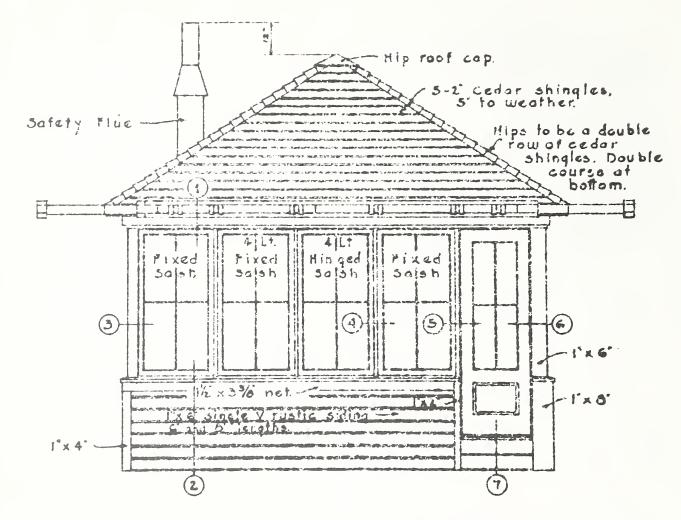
This lookout house was drawn in R-6 in 1934. It has a hipped roof, four light windows and a 14 feet square floor plan.
